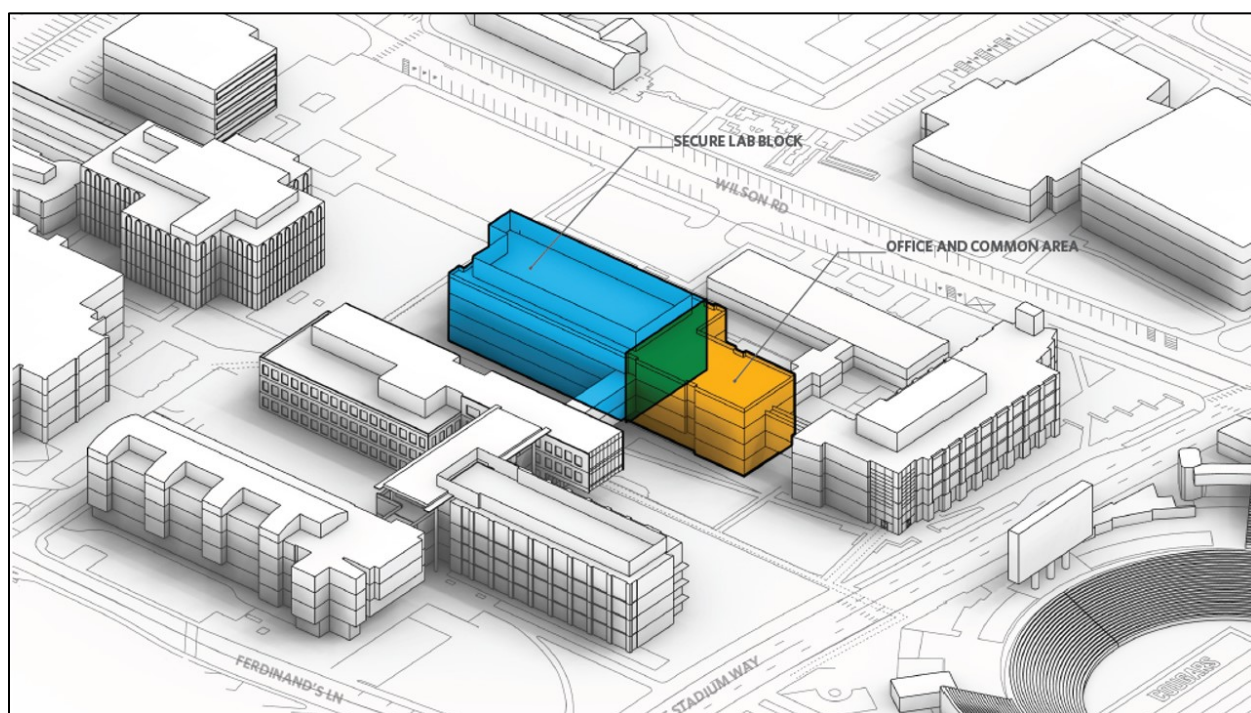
Proposed location and concept of the new Plant Biosciences building on WSU campus, superimposed on Johnson Hall (*to be demolished*) footprint.
